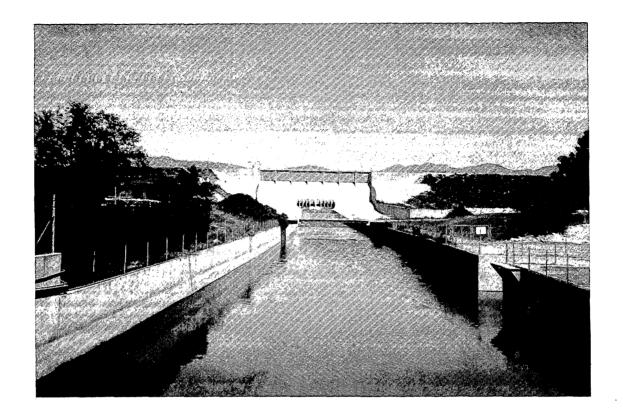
Upstream View of Hansen Dam Embankment, Looking Northwest
